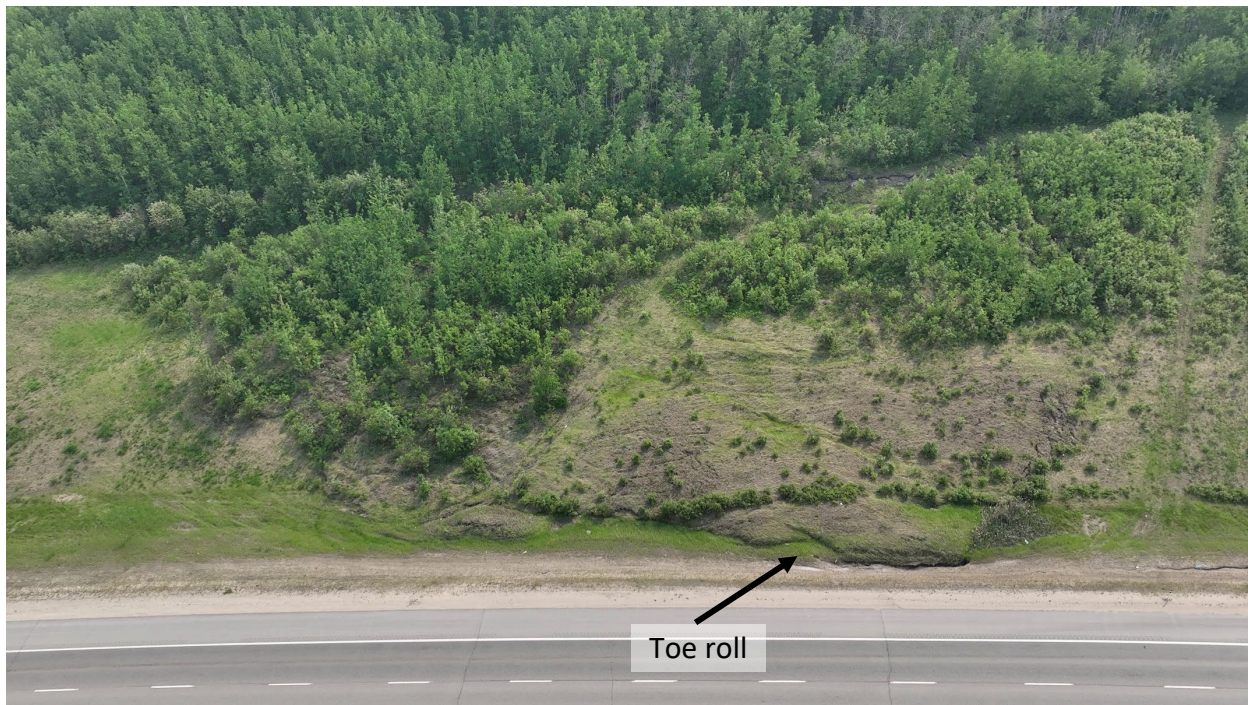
Slope failures along backslope on south side of Hwy 43:04. Note toe rolls and erosion in highway ditch. UAV photo taken June 3, 2025, facing south.
